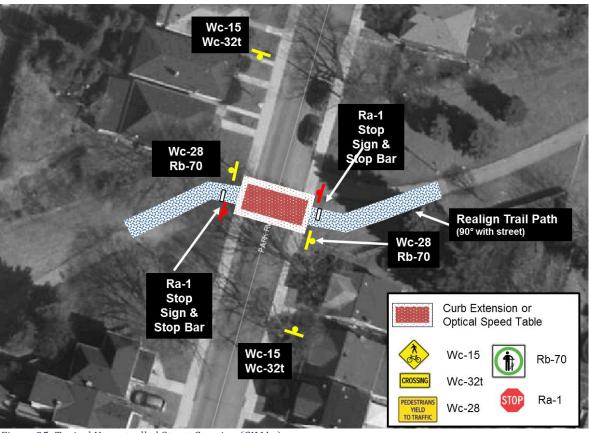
Typical Uncontrolled Street Crossing (CIMA+)
